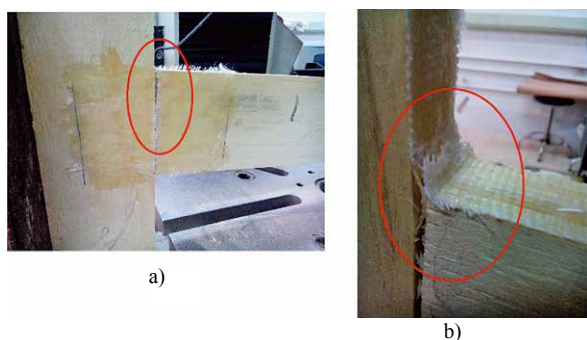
Failure modes, a) Fracture in reinforced joints by method 2S, b) Fracture in reinforced joints by method 2E
